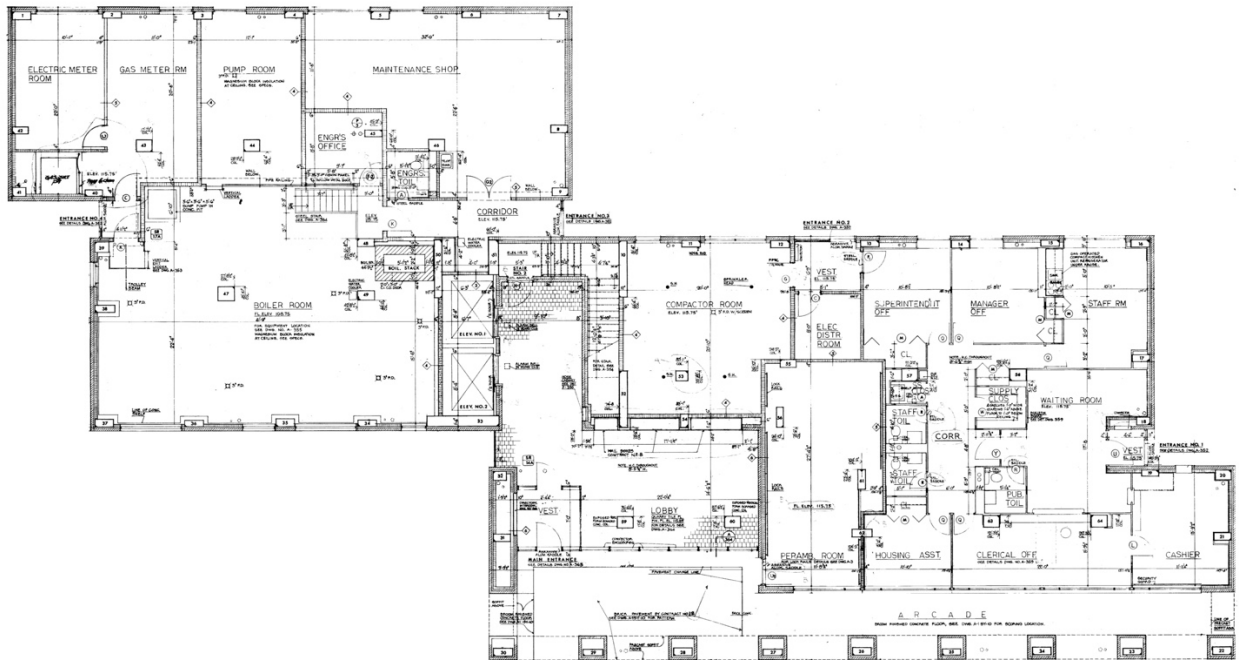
Ground floor (basement) floor plan showing the location of the arcade and main entrance at the west facade. (NYCHA)
